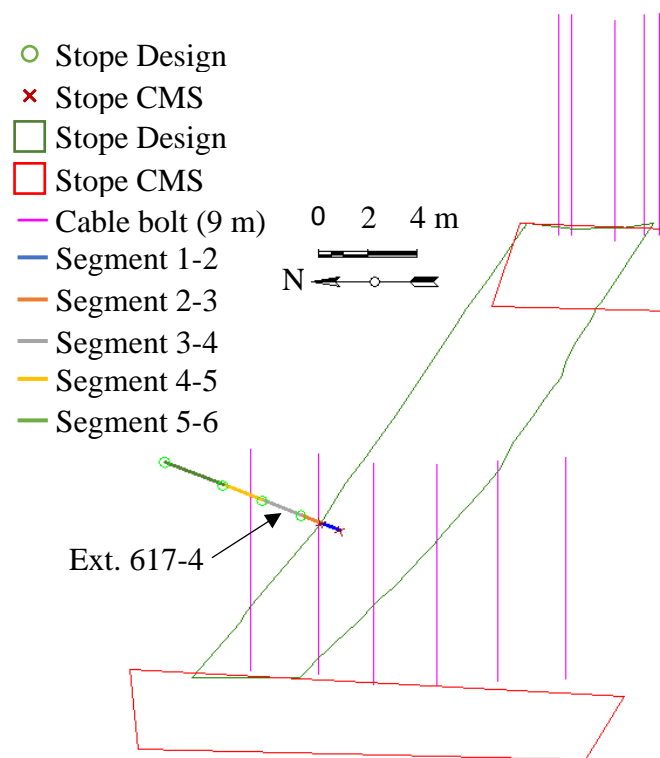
Cross section along XC-4 of the Santoy 30-31L longhole stope looking east and showing the stope design outline, extensometer locations, ground support, surveys, and CMS.
